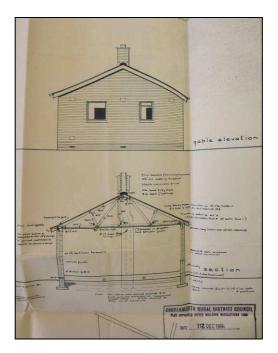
Proposed end elevation and cross section of new bungalow at Moor Park 1966
